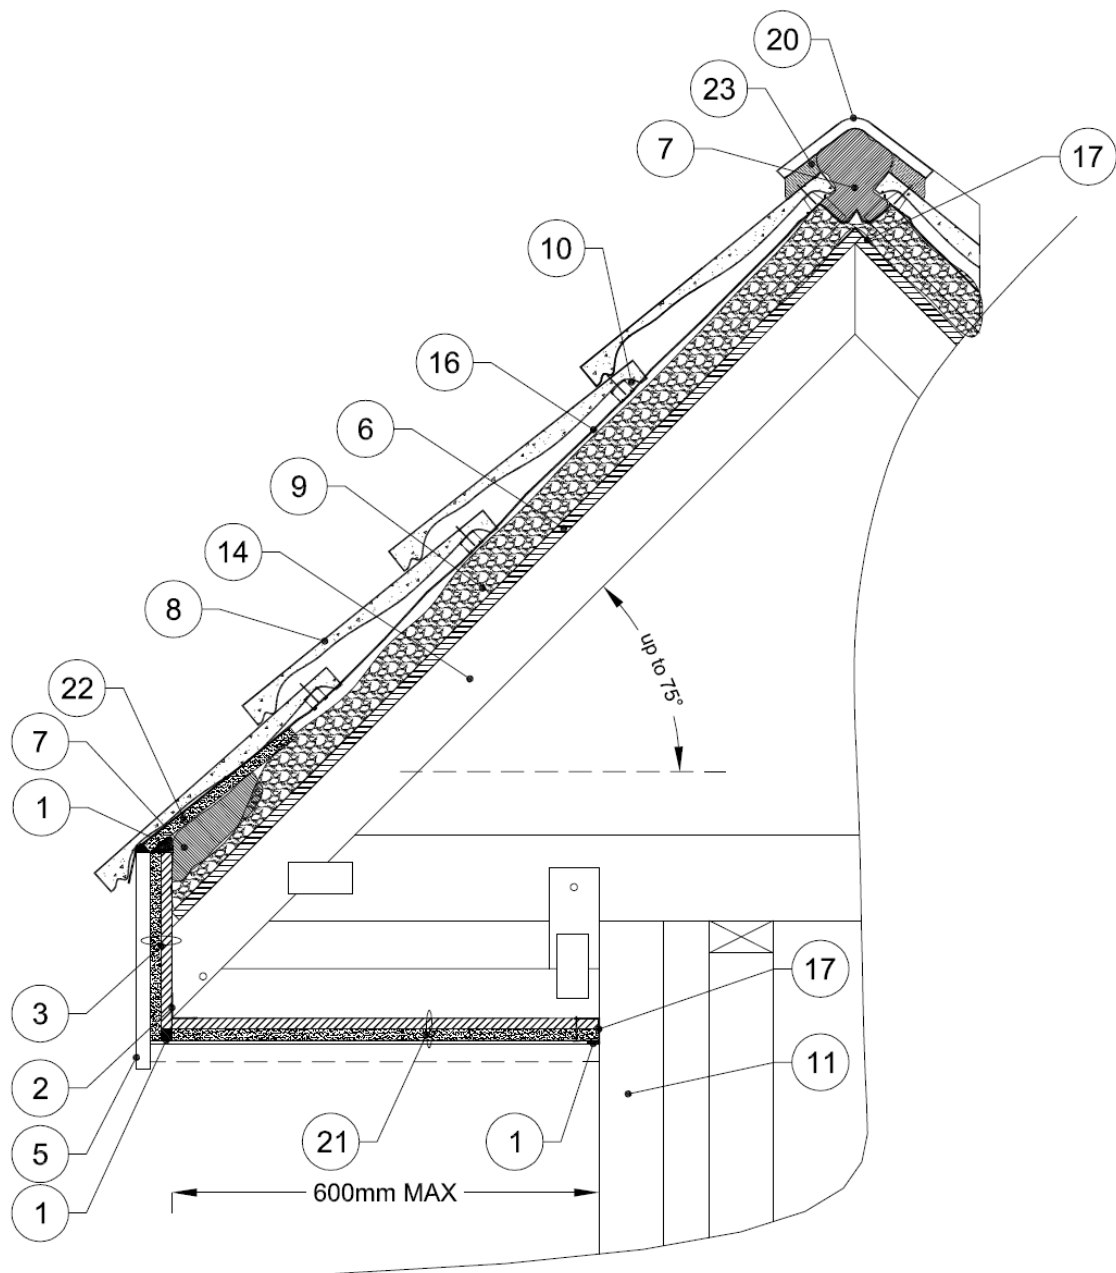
Example of Cut Away plan of a Typical Roof System Incorporating Ridge and Valley
